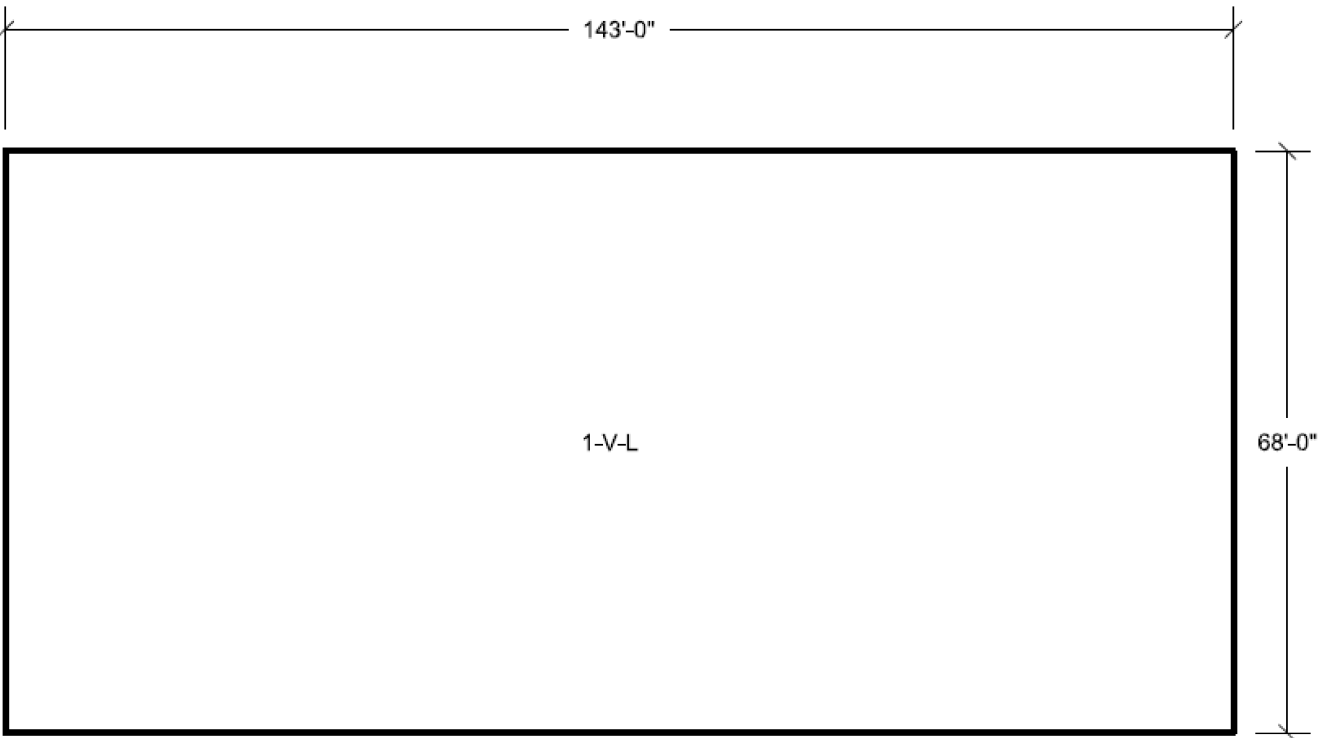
H.6-54 Pump House North Wall Looking South Vertical Reinforcement Zones Far Side Face
